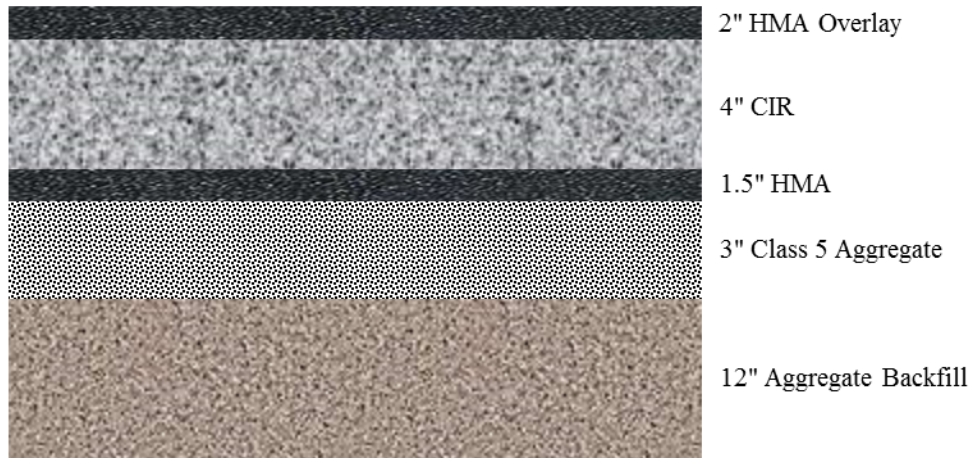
Pavement structure for Brown County CSAH 22 Section II
